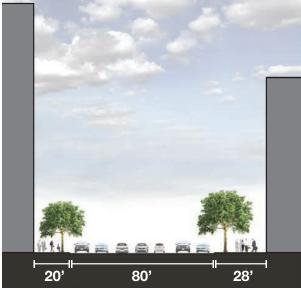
Section B - Pennsylvania Avenue NW between 21st Street NW and 20th Street NW
